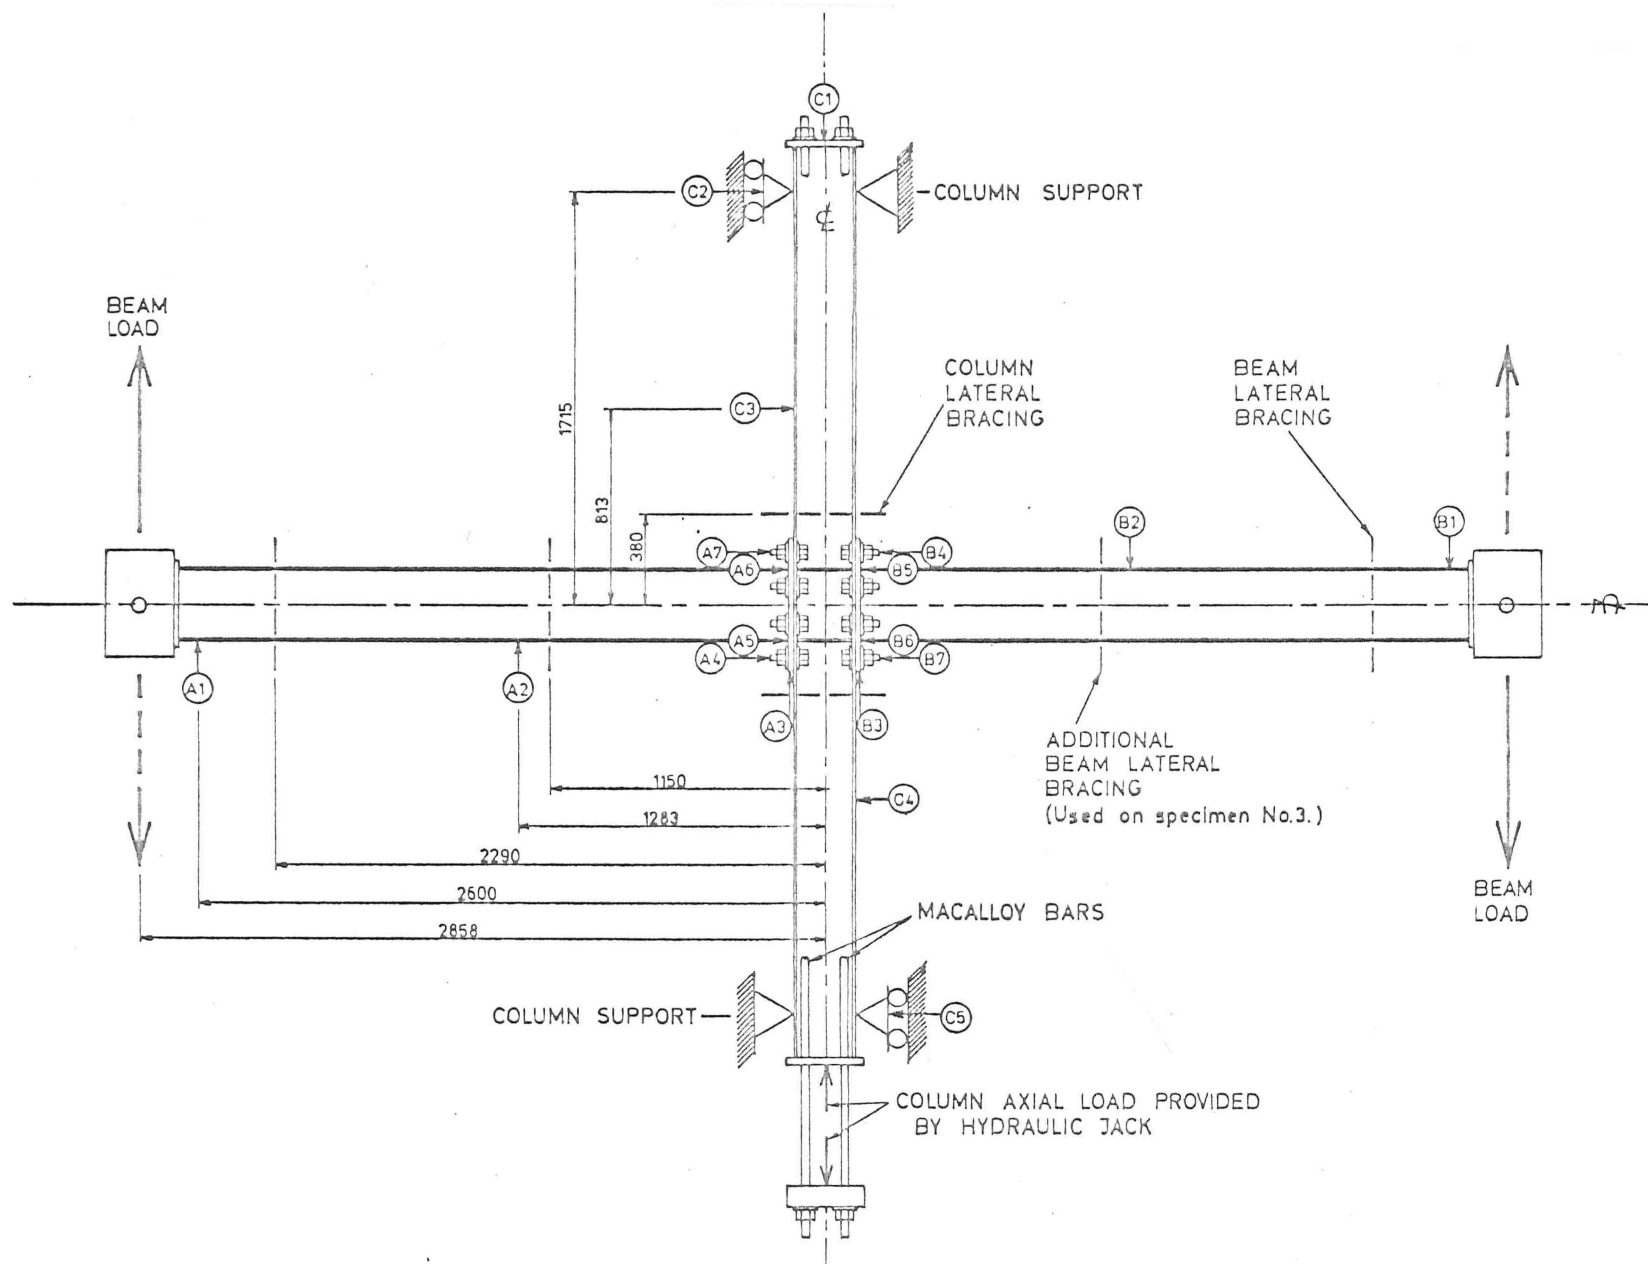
Plan of the specimen, lateral bracing, dial gauges and load positions.
